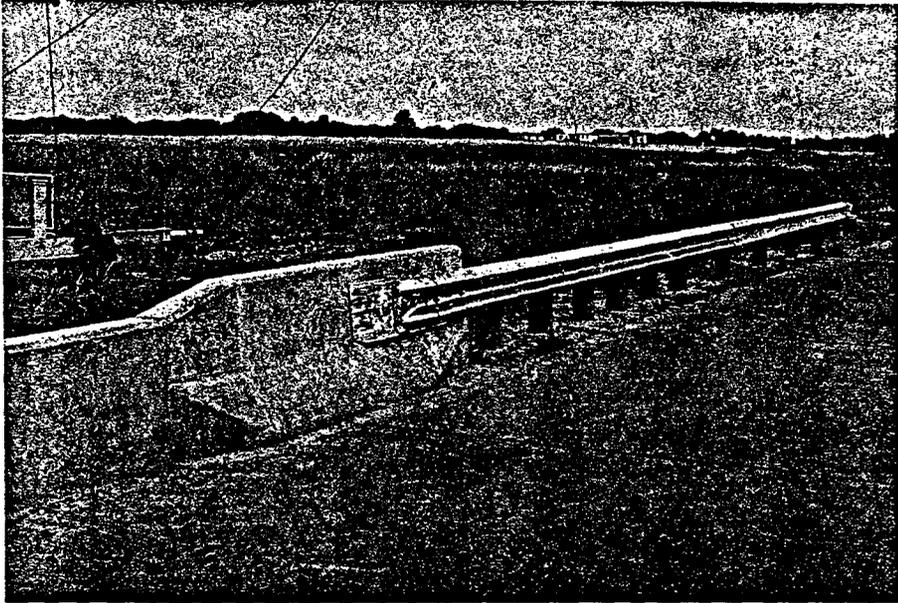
TUBULAR W-BEAM TRANSITION TO CSSB, TEST 2
